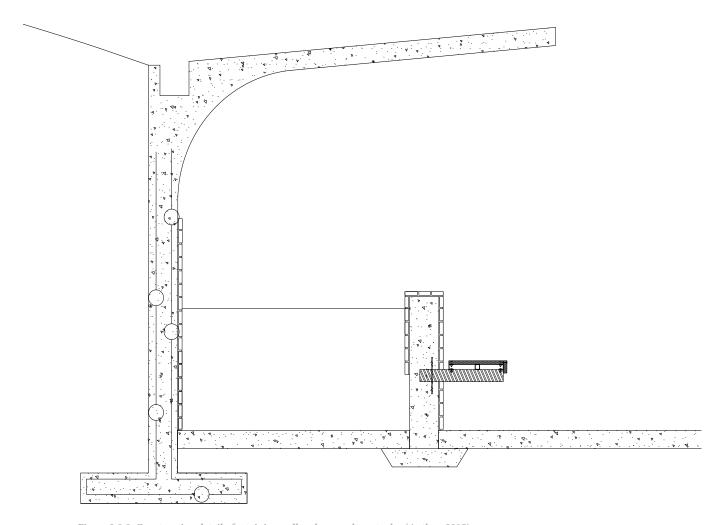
Construction detail of retaining wall and aquaculture tanks. (Author, 2015)
